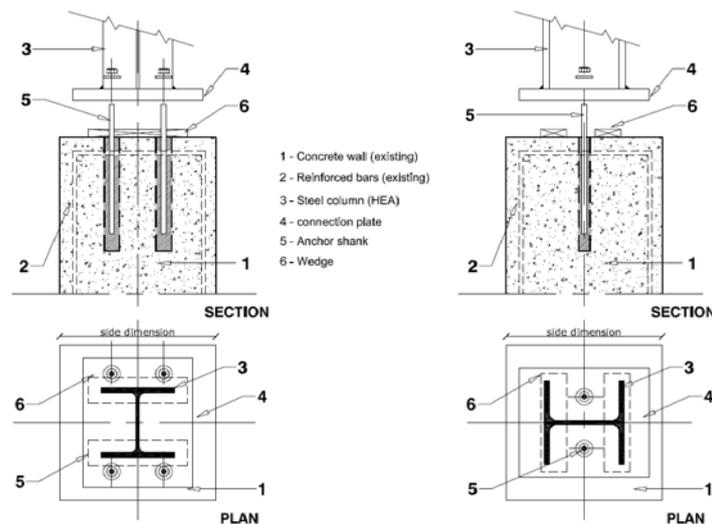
Point connection: Connection every 3 m laterally, 6 m span, rolled sections, considered as pinned connections.
